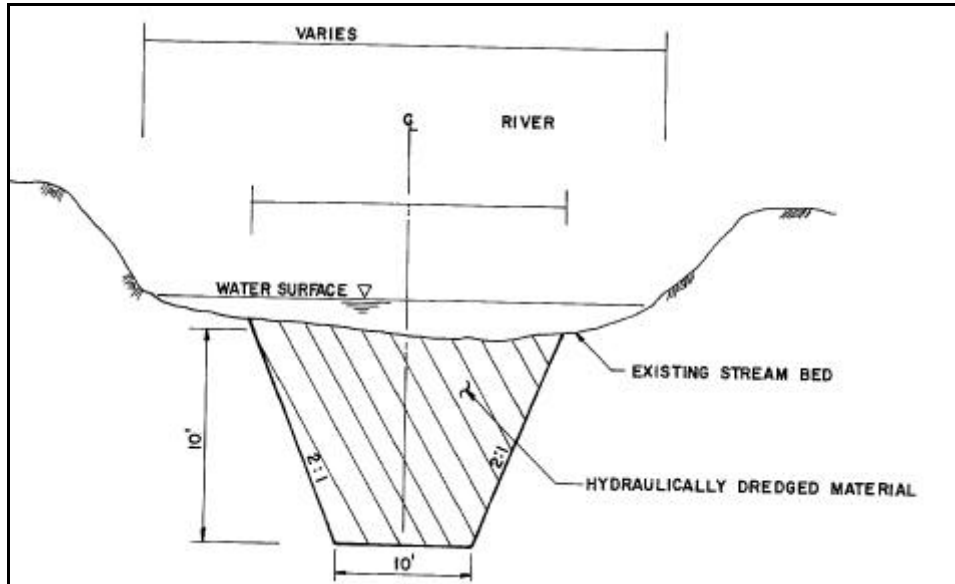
A sediment trap typical section showing areas subject to hydraulic dredging (Source: CBBEL Files)
